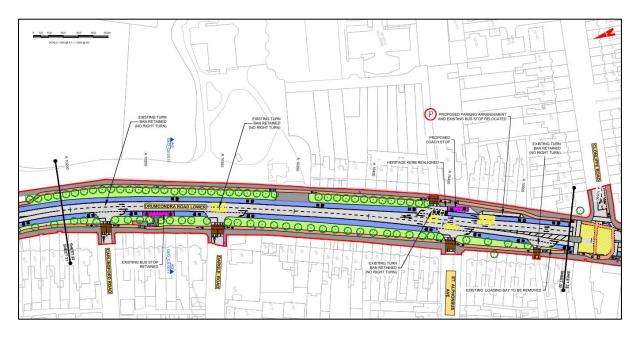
Extract from General Arrangement Drawing (Sheet 32)
